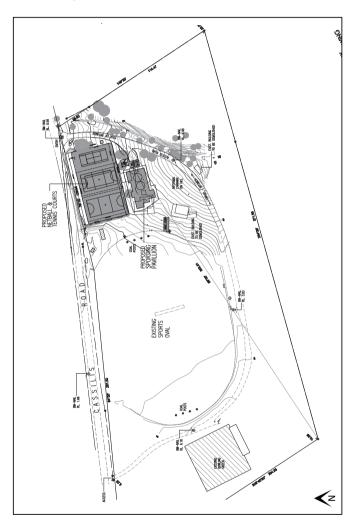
Swifts Creek Recreation Reserve Master Plan
